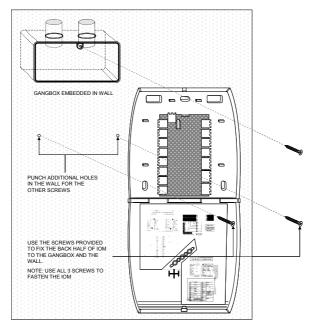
Fixing the IOM on a concrete wall using gang-box and conduit
